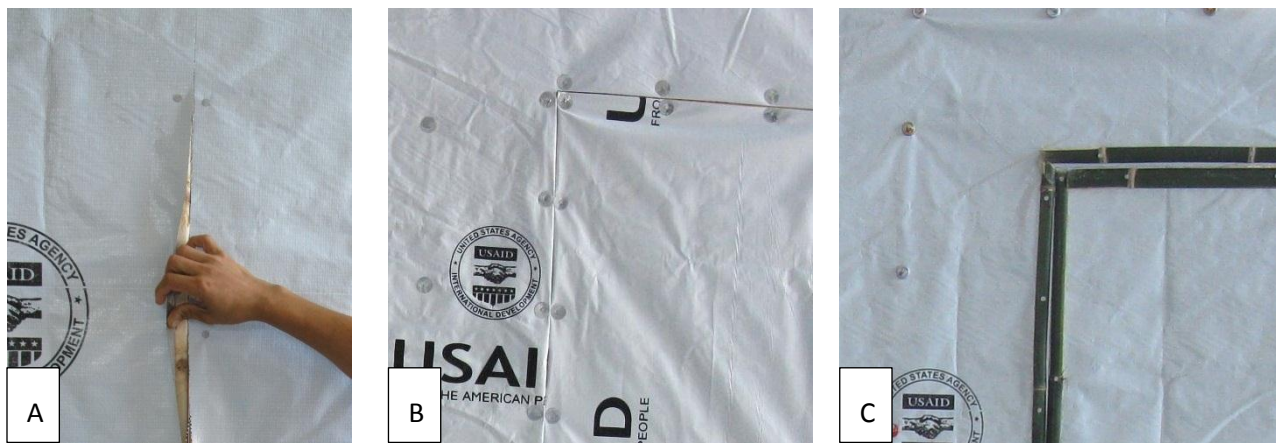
Plastic attachment: (A) bare nails, (B) roofing nails and tin caps and (C) nails with bottle caps and bamboo battens
